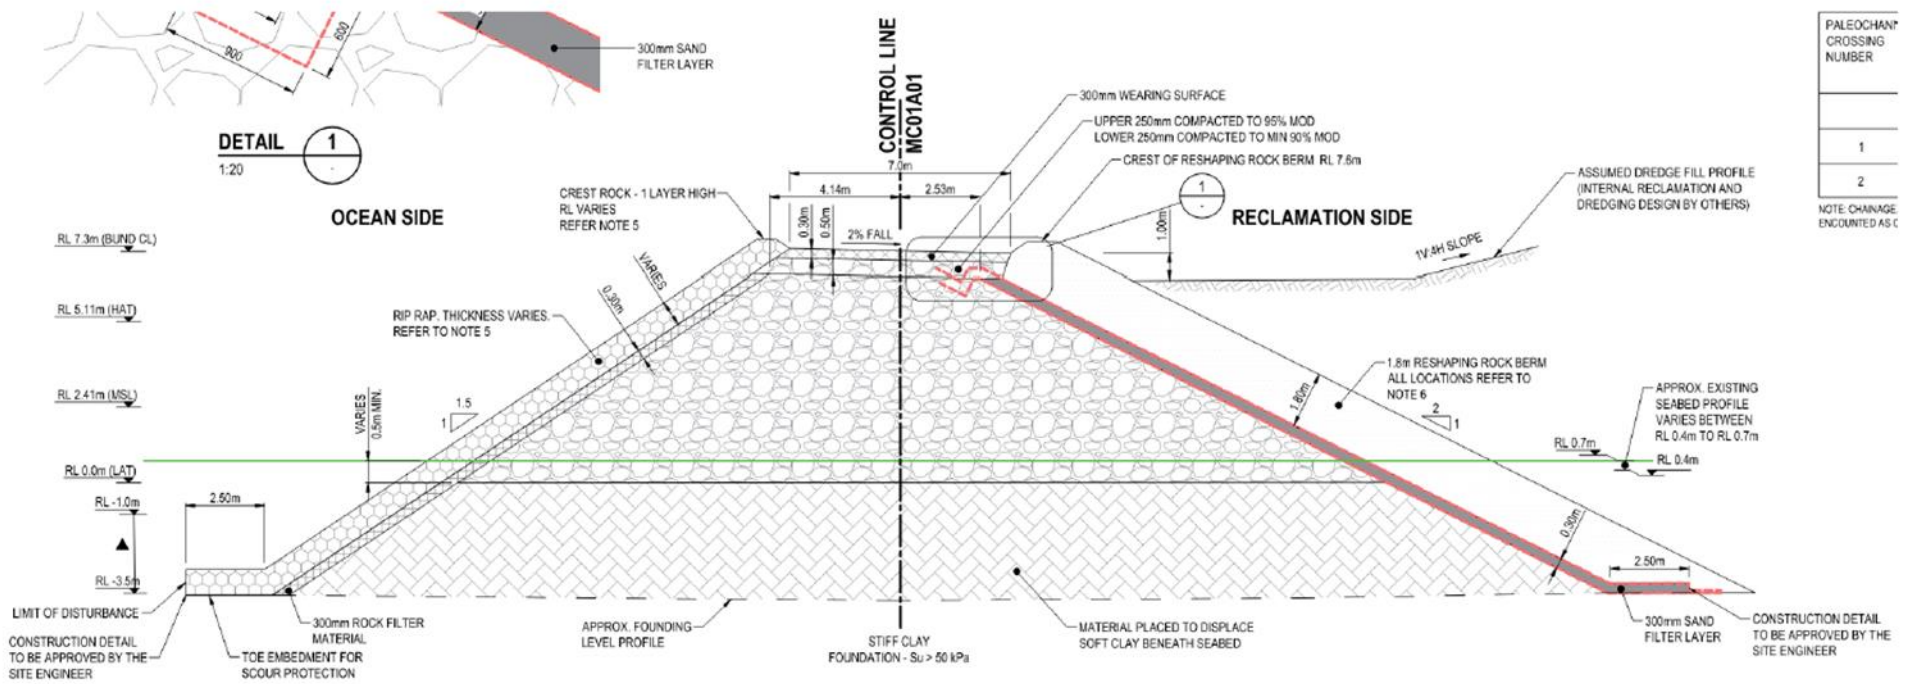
Proposed Bund Cross Section in Paleo-Channel Areas
